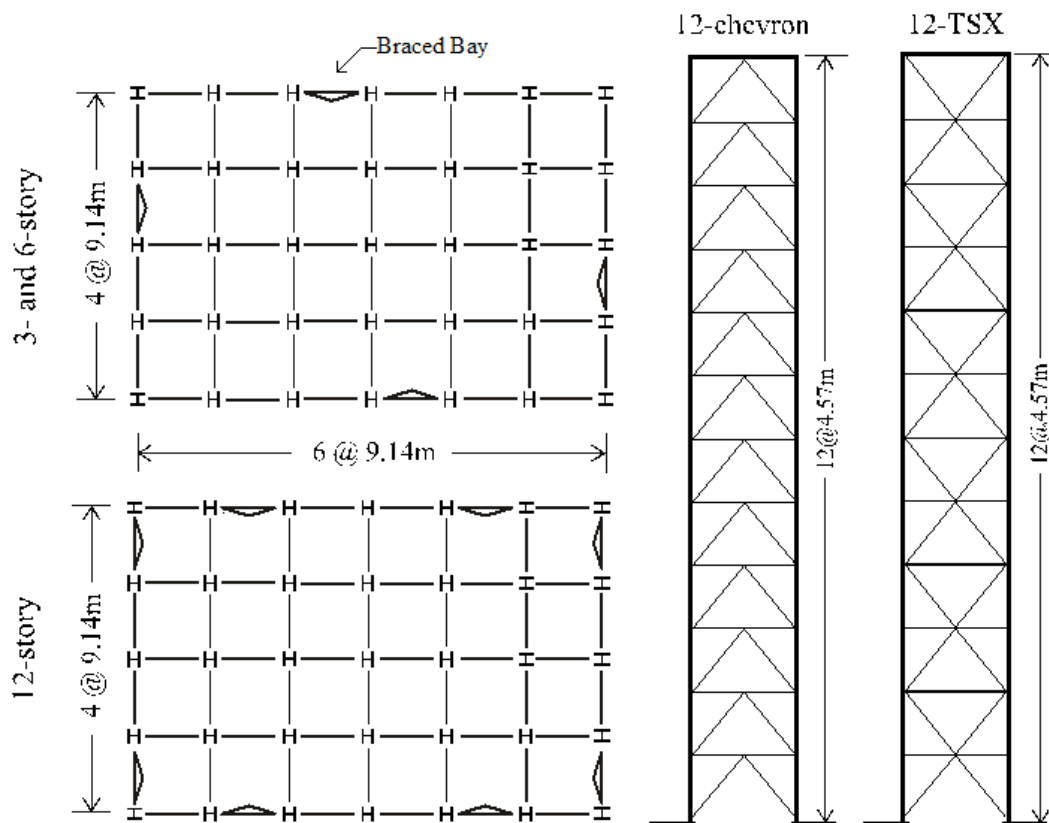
Plan layout of the SCBF archetypes along with the elevation layout of the 12-story SCBFs (Salari et al., 2022).
